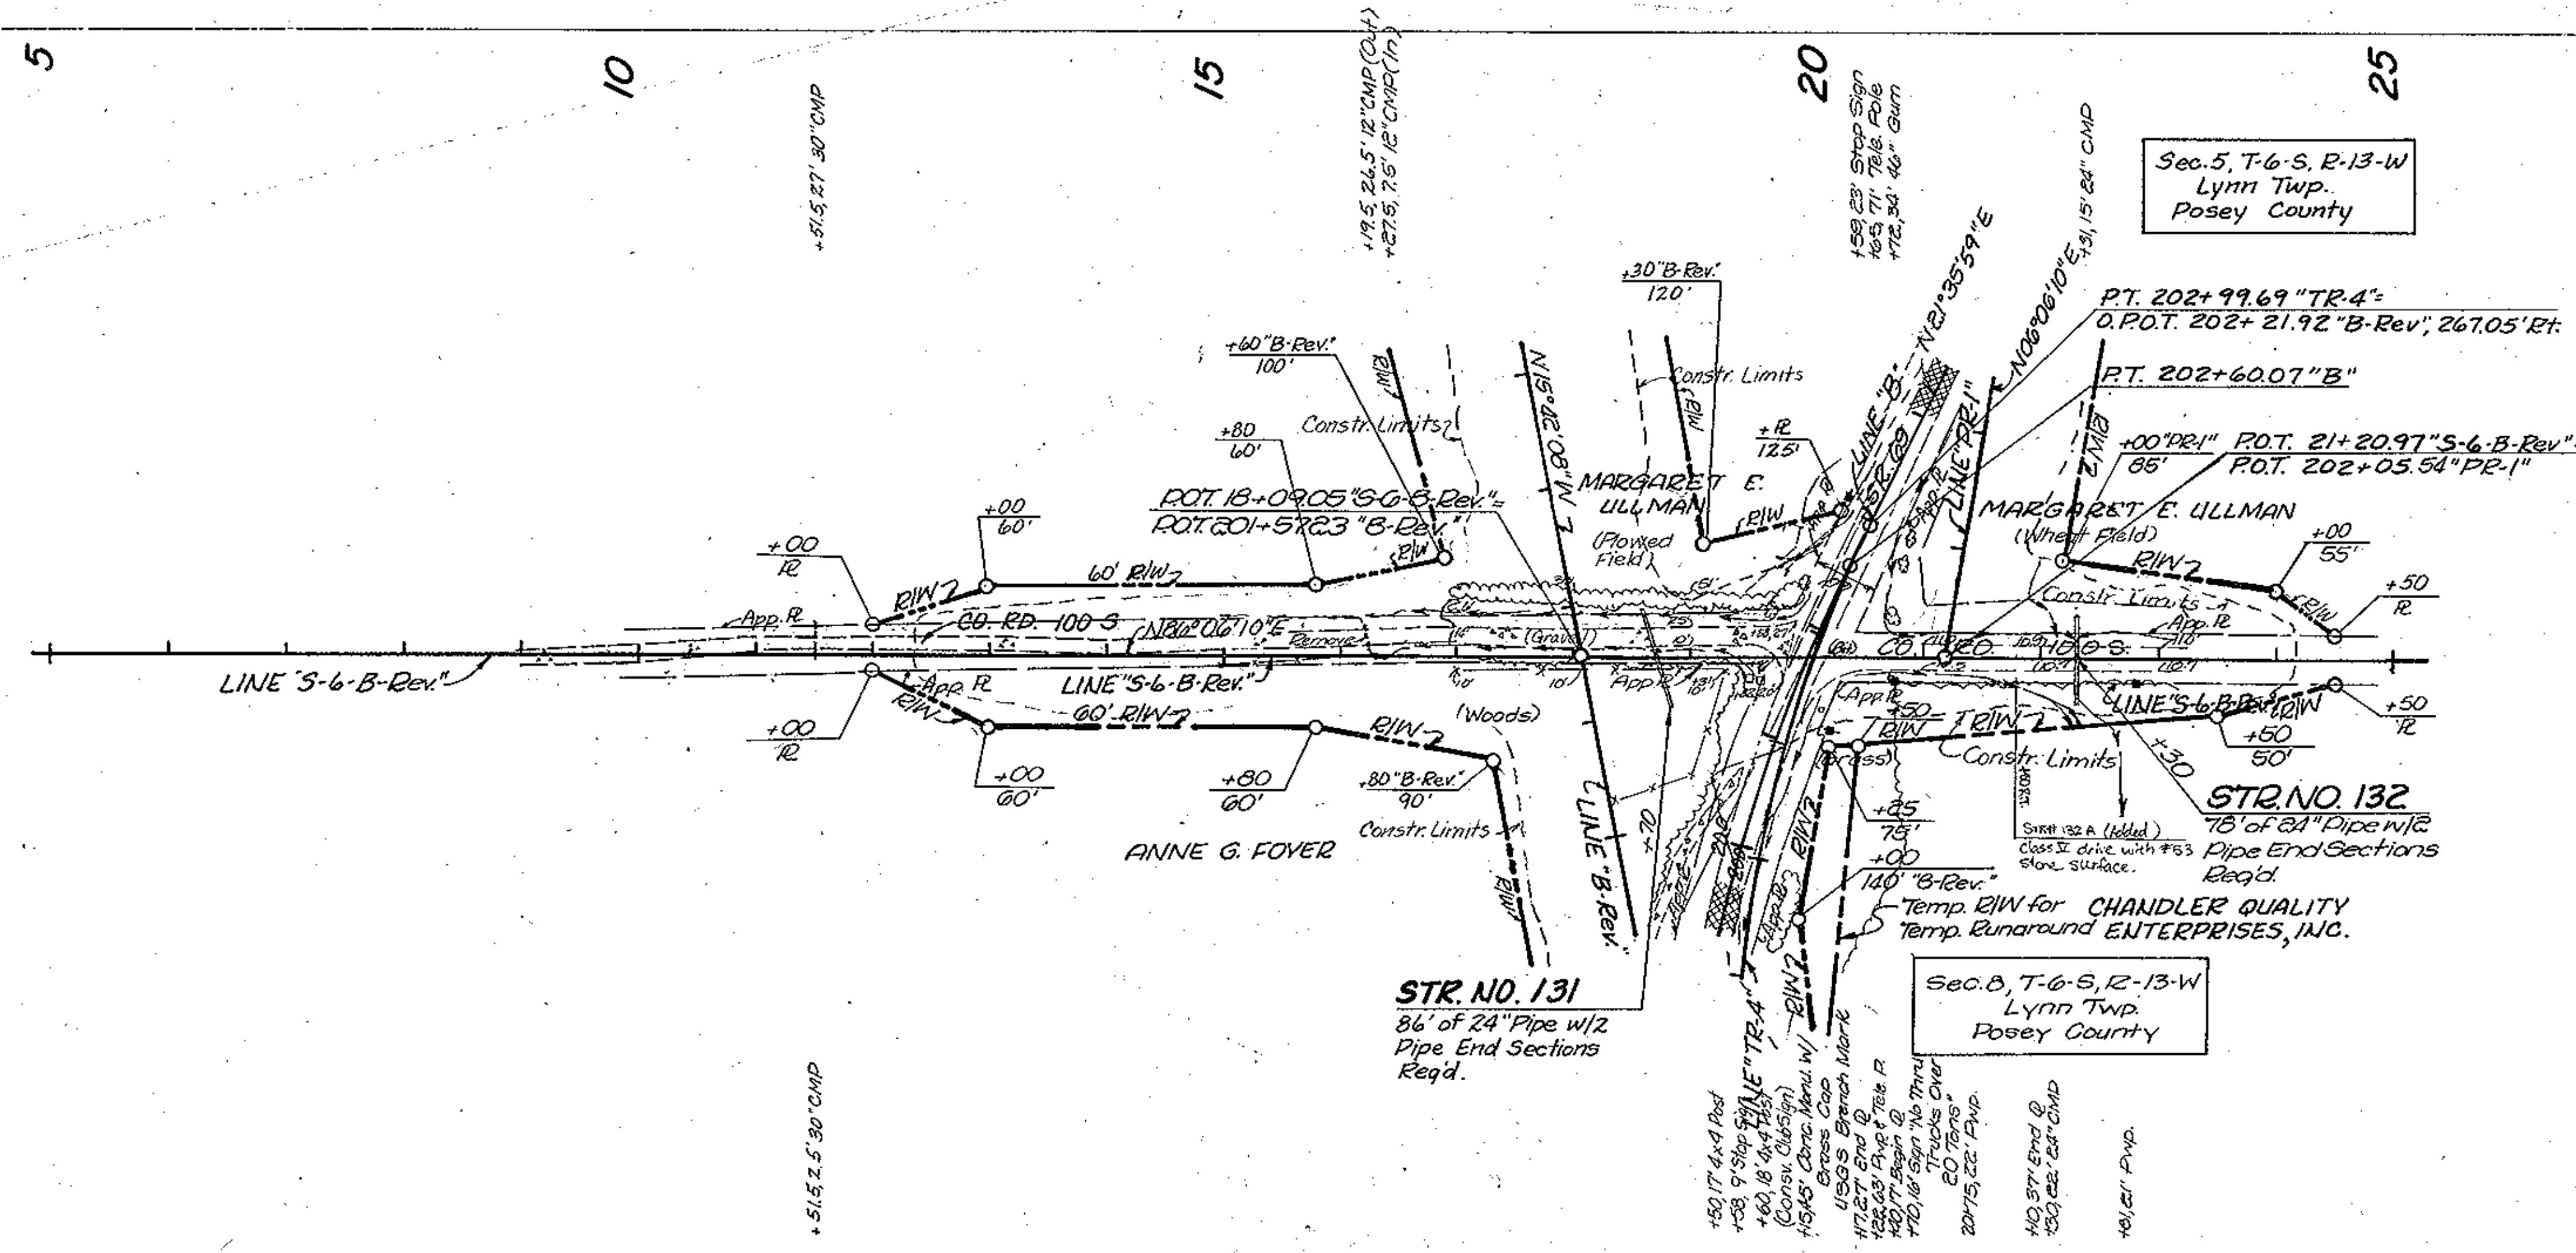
PLAN - PROFILE & R.R. STANDARD
